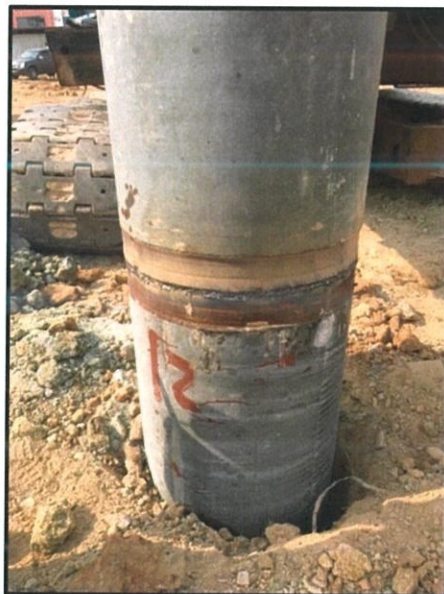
The joint is welded, and excessive parts are removed
